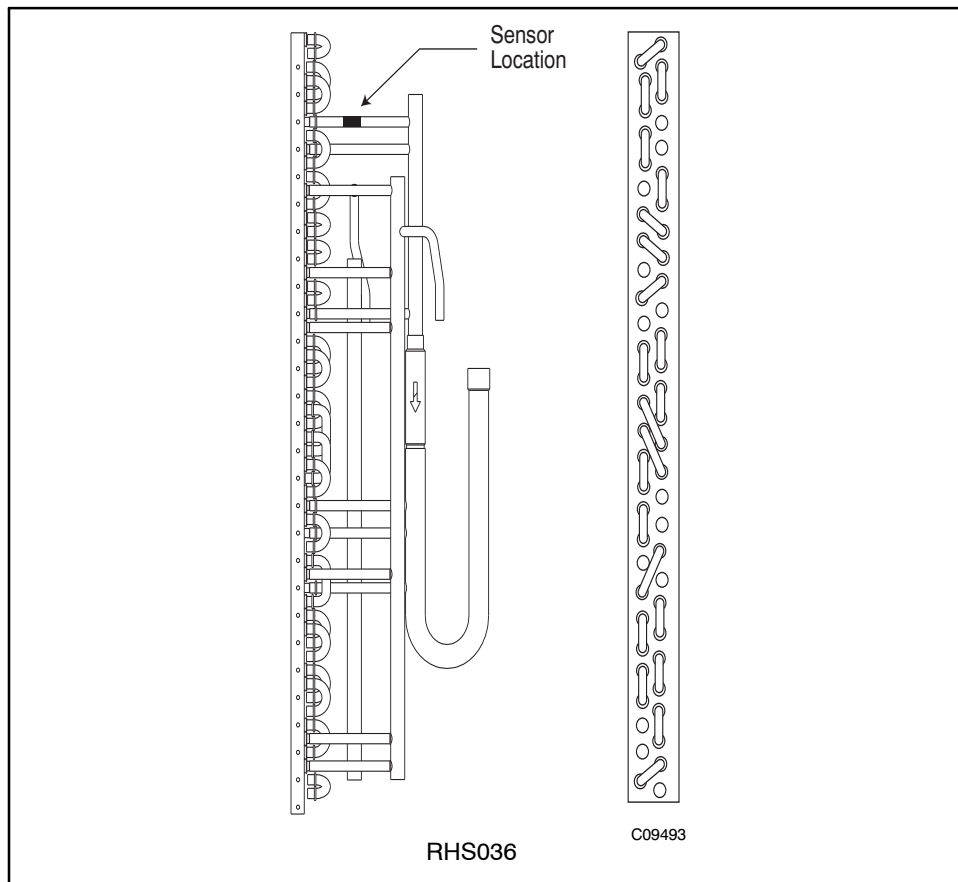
Motormaster® II Sensor Locations – 3 Ton Heat Pump Units
